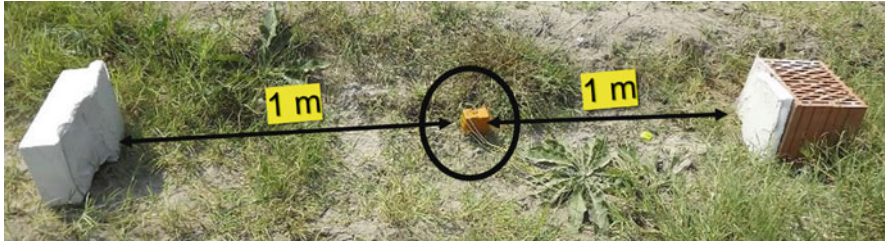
The explosion test setup with 1 m distance from the explosive charge
